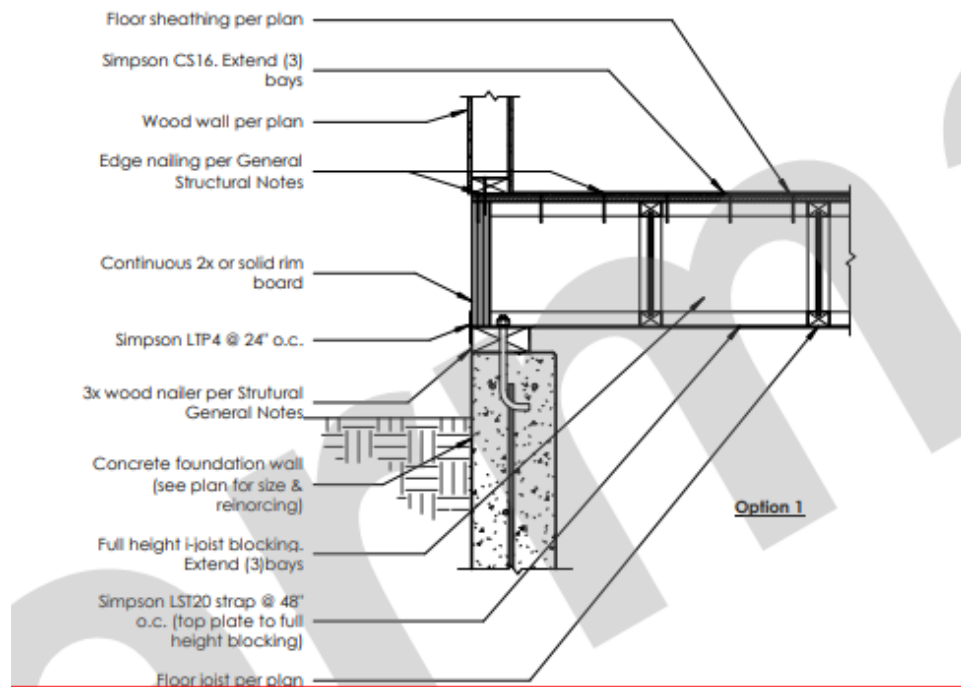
FIGURE B: FOOTING CONNECTION TO WALL/FLOOR DETAIL
